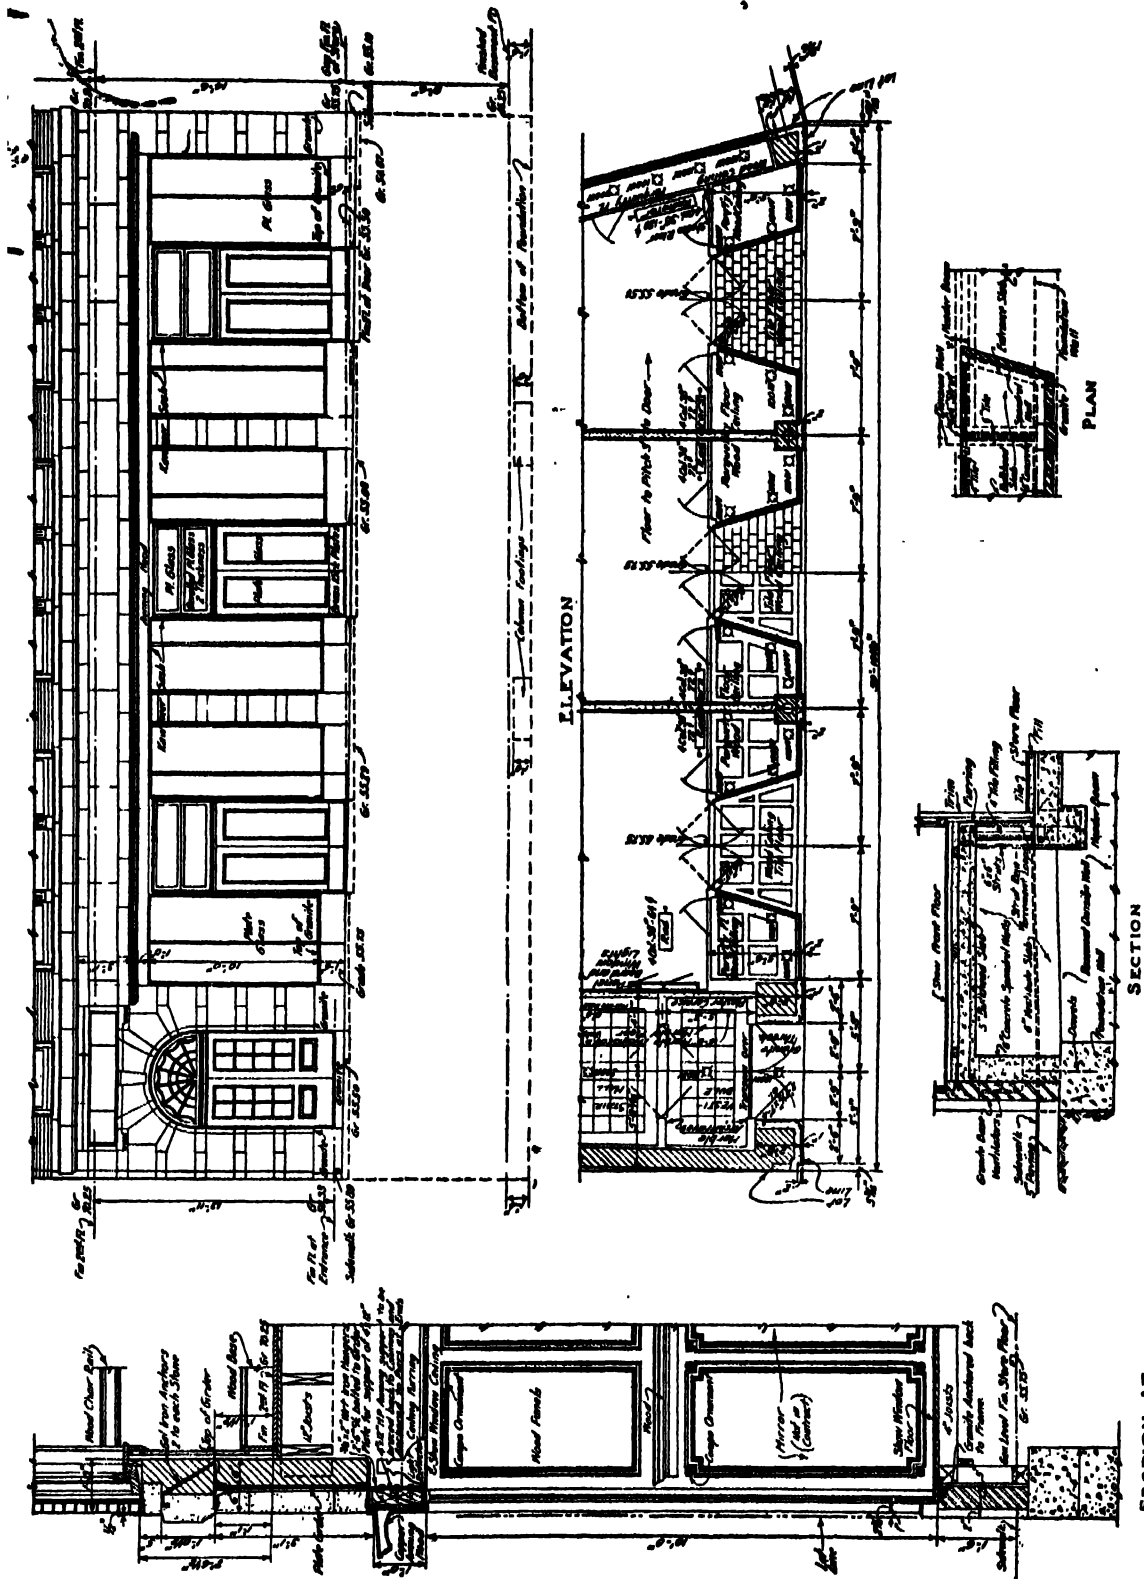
TYPICAL STOREFRONT CONSTRUCTION
